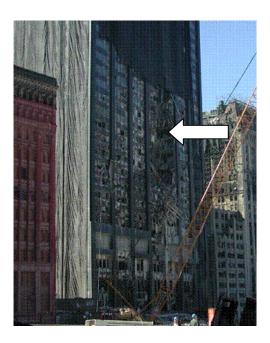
Deutsche Bank Building remains standing despite column loss over multiple stories (see arrow)
